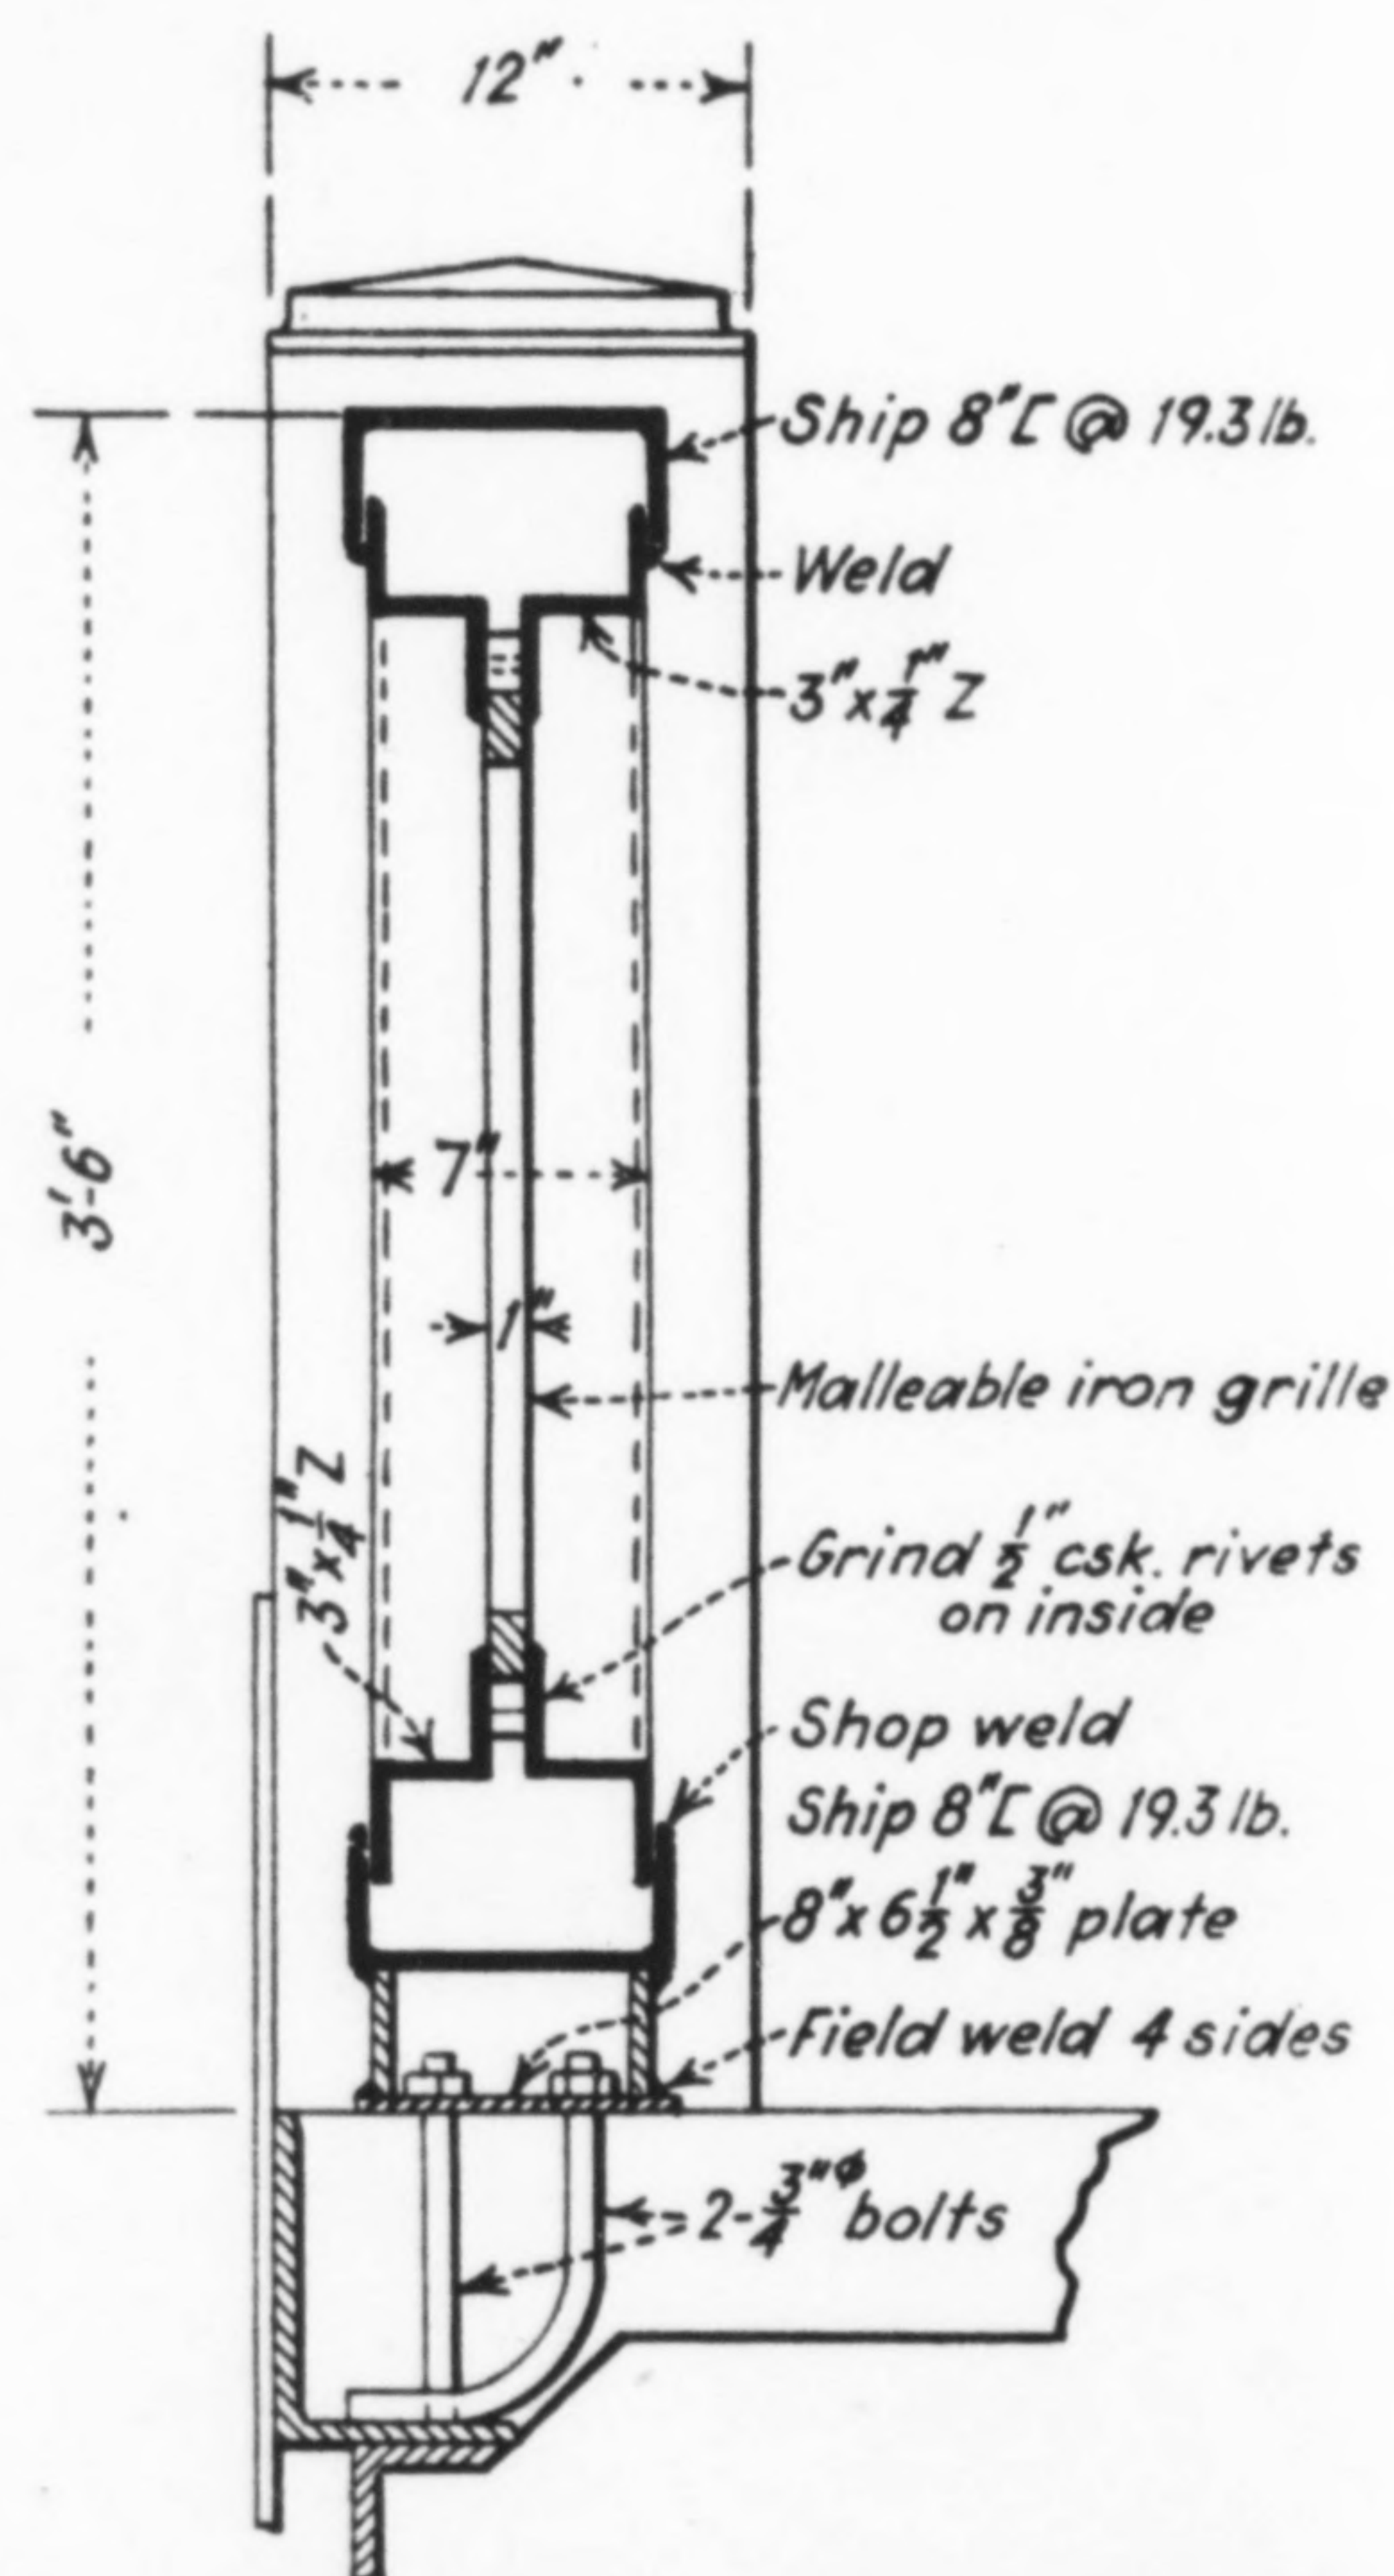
RAILING of welded shapes with malleable iron grilles. A 5-ft. sidewalk and a 12-in. curb supplement the rail in its function of keeping cars on the bridge deck.
